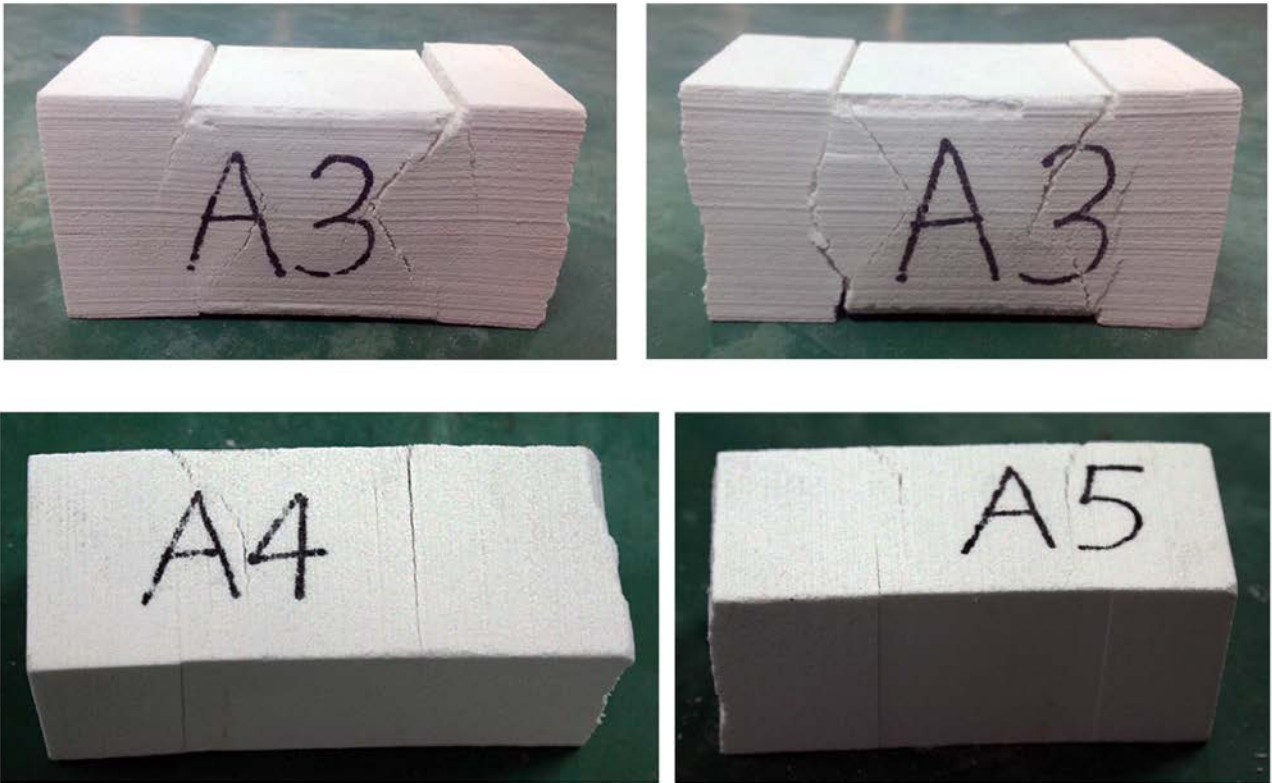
Failure mode of half beam tested under compression:(a) loaded in Z direction and (b) loaded in X direction
